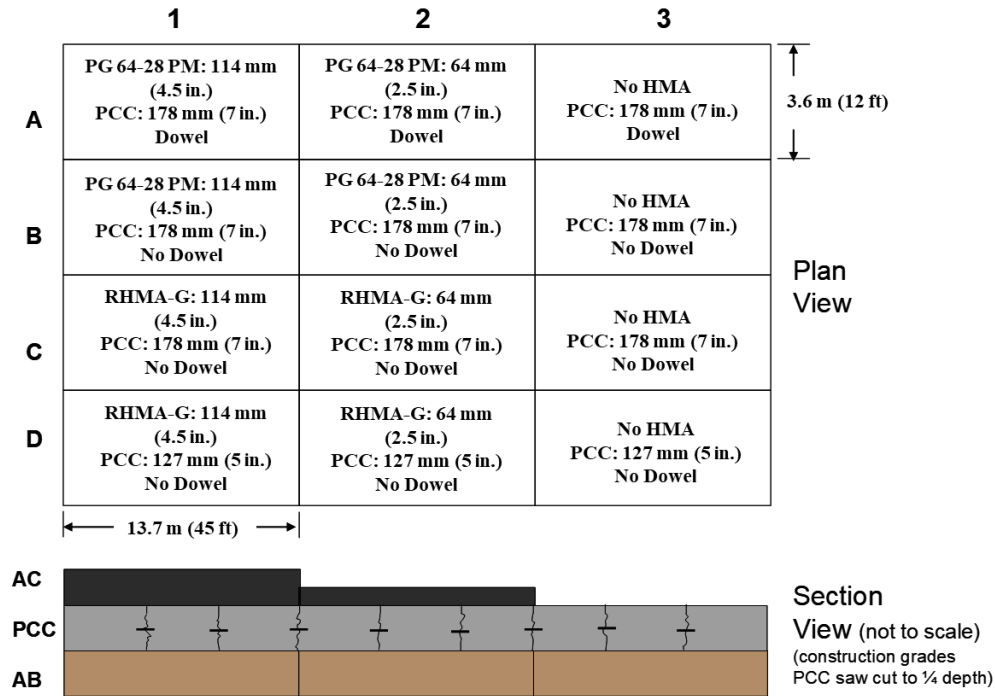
Pavement structure for R21 test sections with plan view (top) and section view (bottom)
